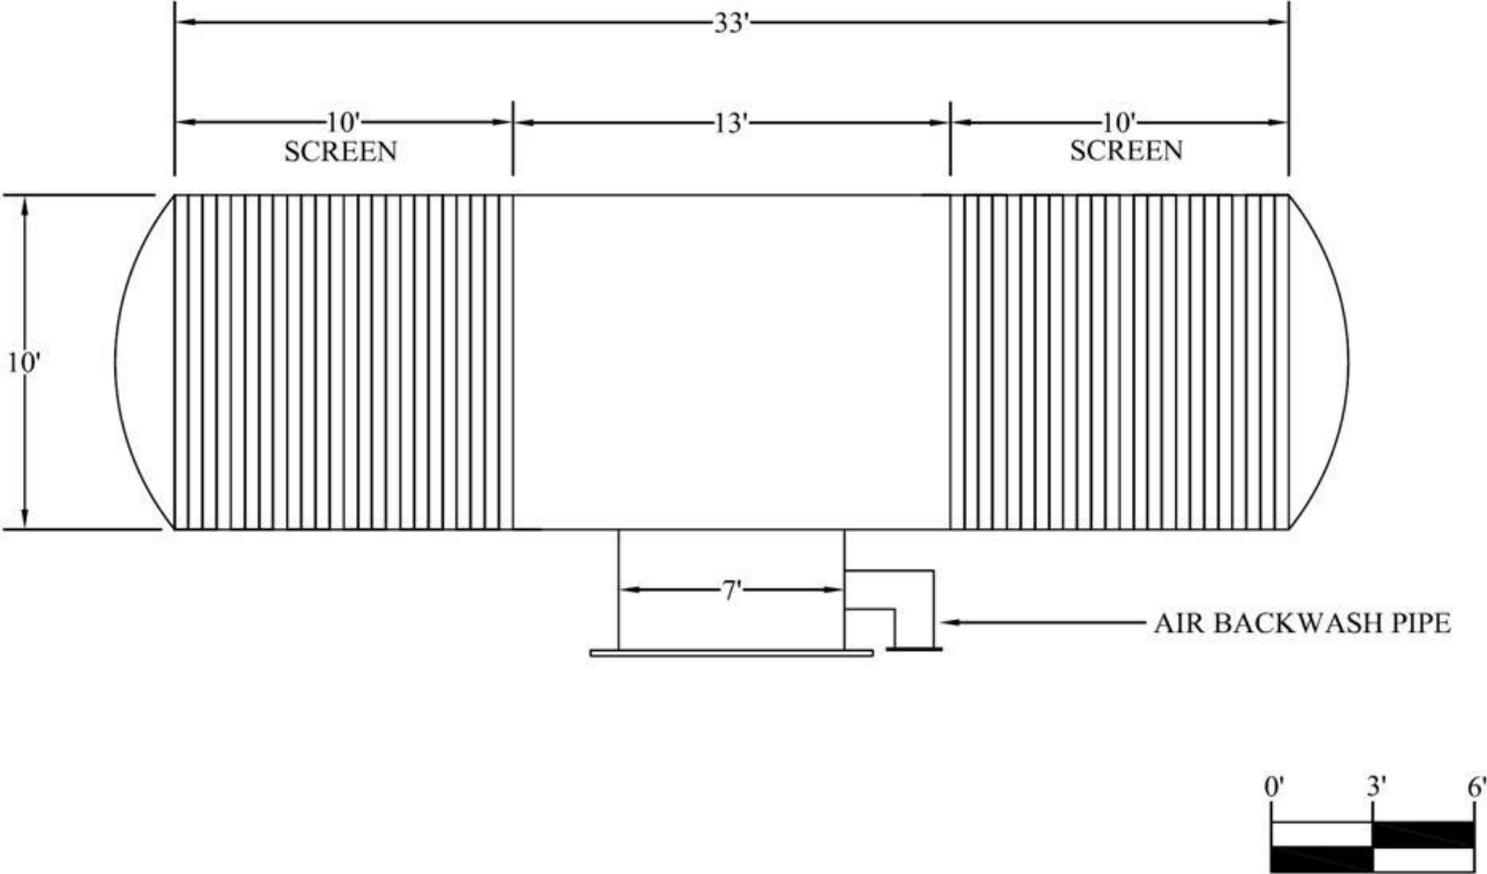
Wedgewire Layout 1 "Tee"- Plan
